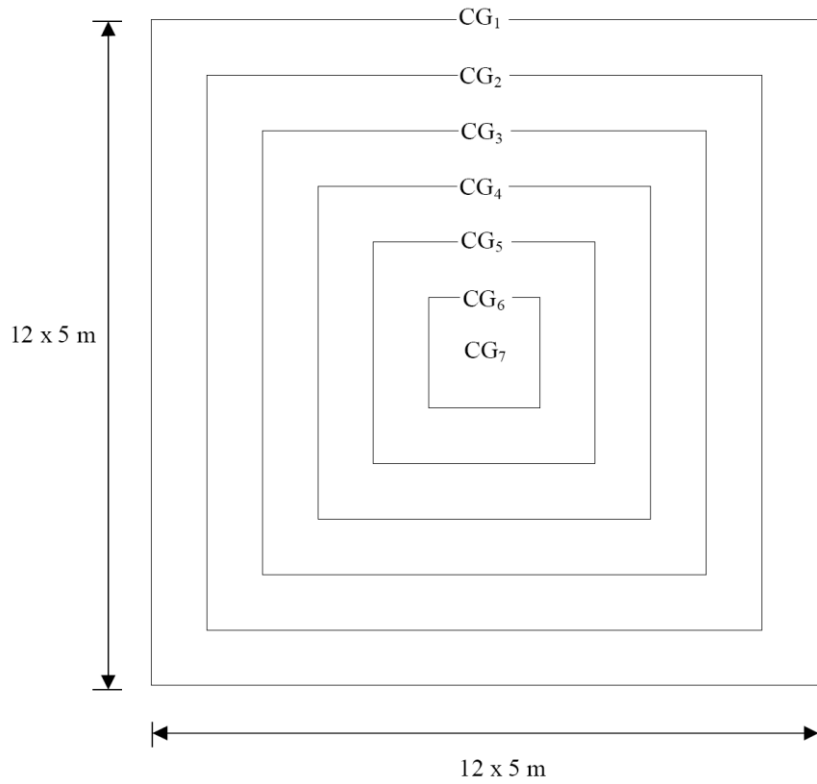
Outline of column grouping in plan level for 11540-member steel frame
